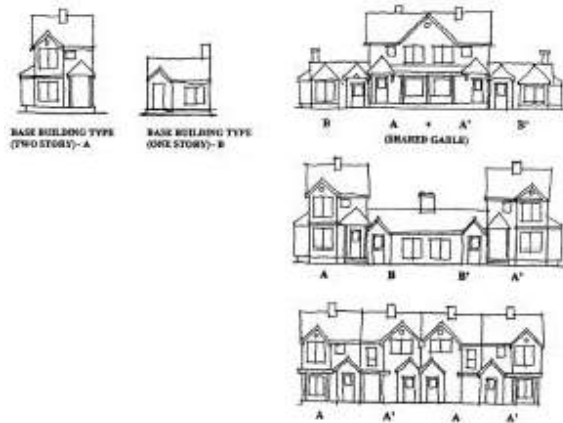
(E)(2). Acceptable townhouse configuration employing the repetition with variety concept.
